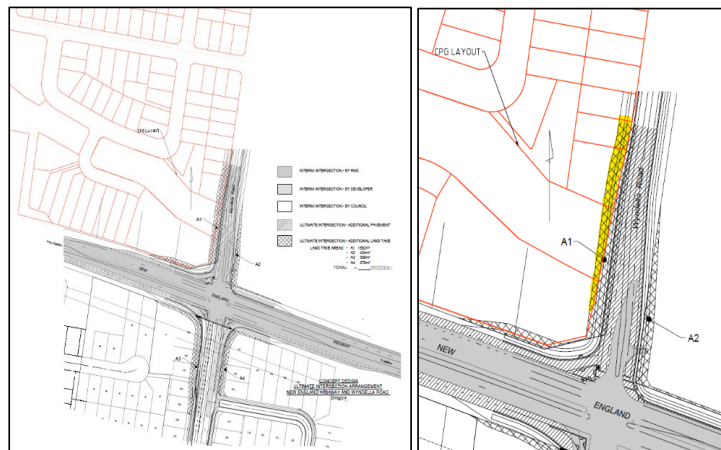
Overlay of Proposal against Footprint for Planned LURA Intersection (yellow highlight is intersection area not provided for by Proposal)
